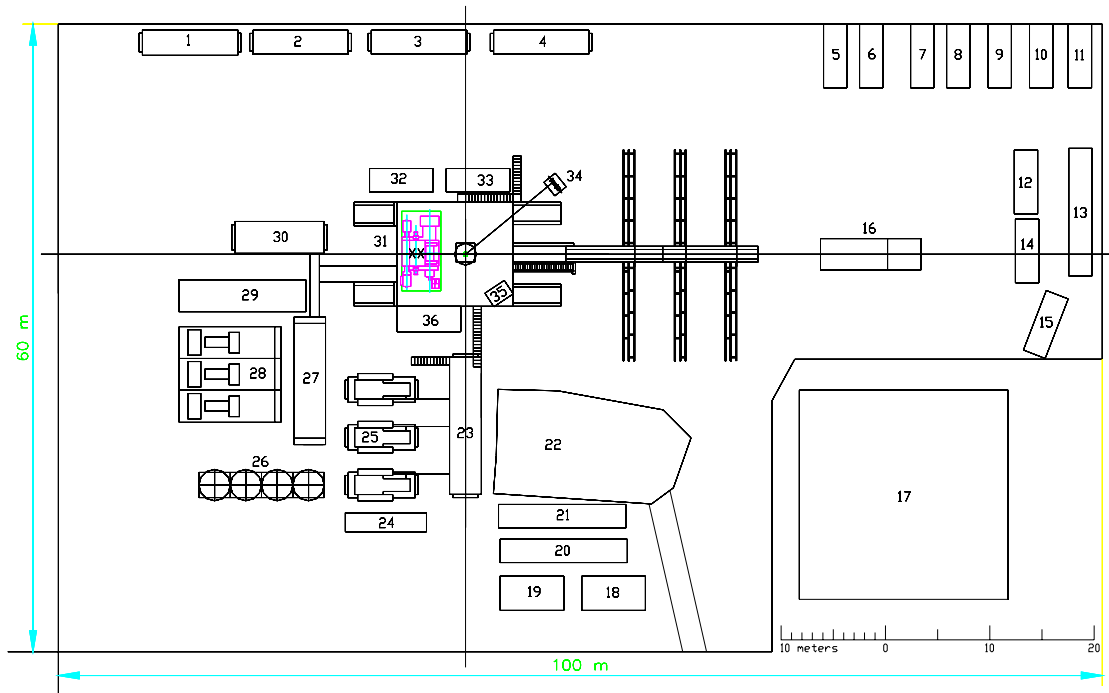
Proposed lay-out of drill site. Outer dimensions 100 x 60 m.
